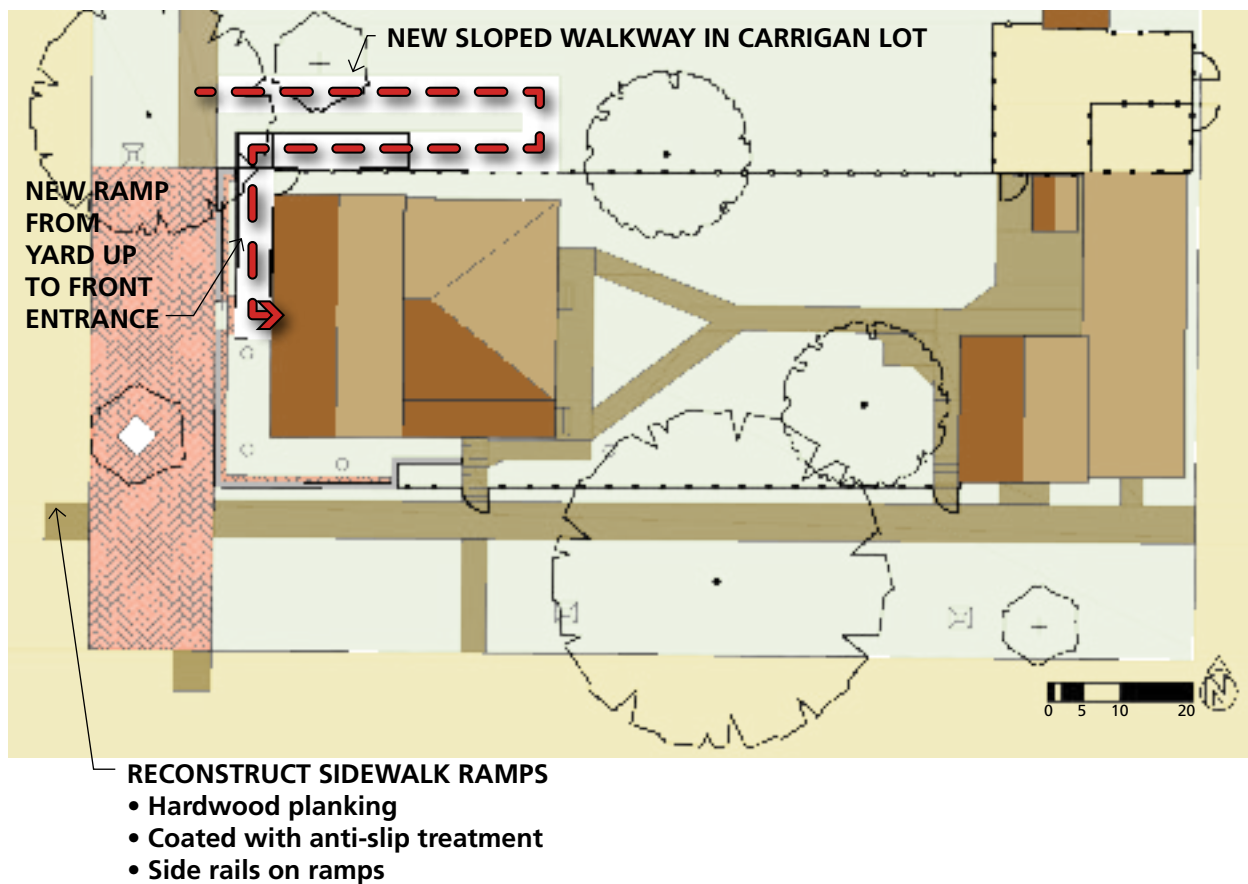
Concept alternative showing equal access from the front door from 8th Street. Source: WLA Studio.
